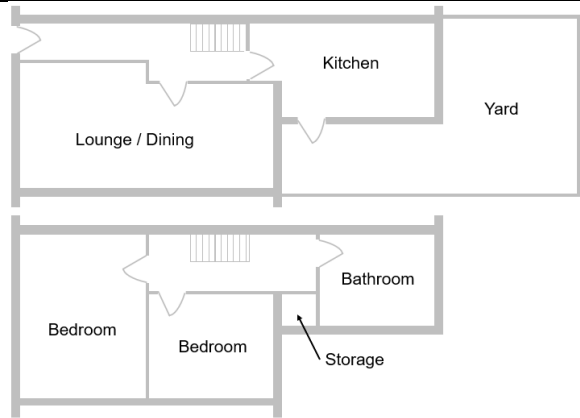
Example Layouts (C3 property being considered for a change of use to C4)
